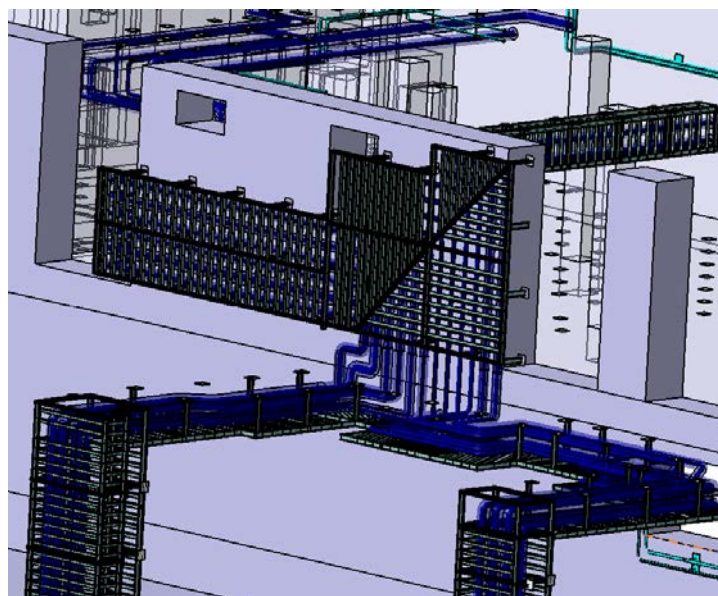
View of TBS connection pipes in Level 3 and 4 of the Tokamak building (the models of pipes supports and protection grids are also shown).
